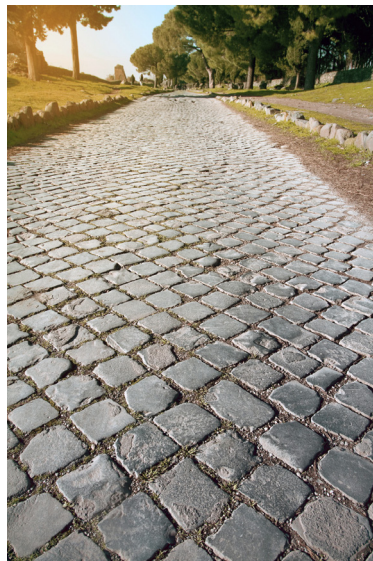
Figure F-i. Ancient Interlocking Pavement: The Appian Way near Rome ca. 312 BC (Source: Interlocking Concrete Pavement Institute)
